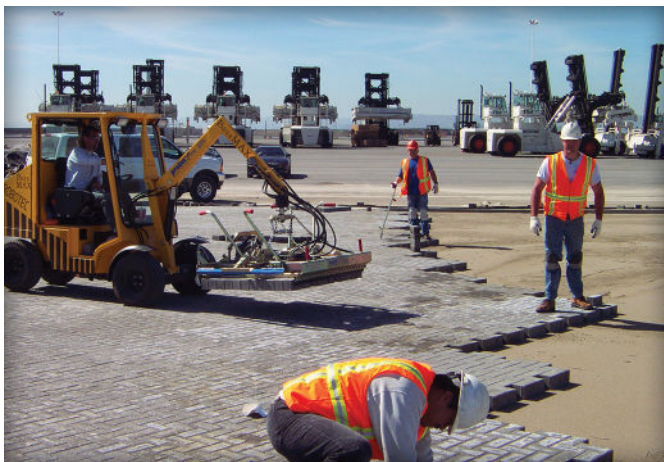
Mechanical installation equipment at Port of Tampa, Florida.
